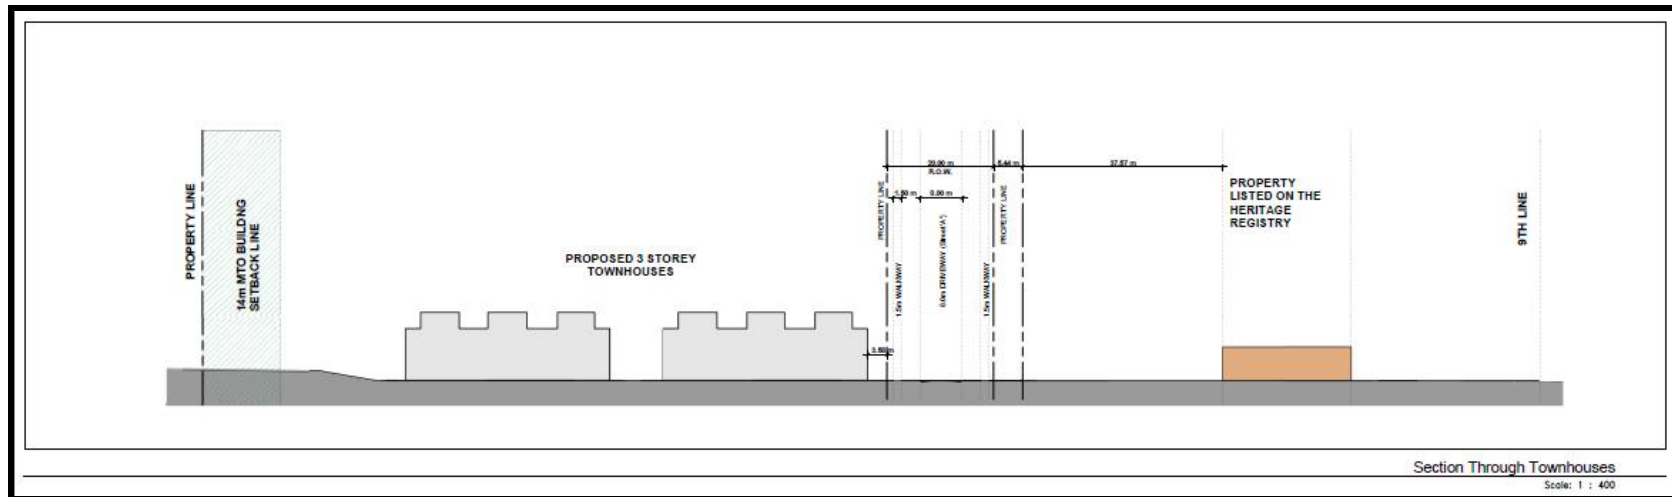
July 2021 Proposal Section Showing Proximity of Townhouses to 5104 Ninth Line, looking Northeast (Kirkor 2021b)
